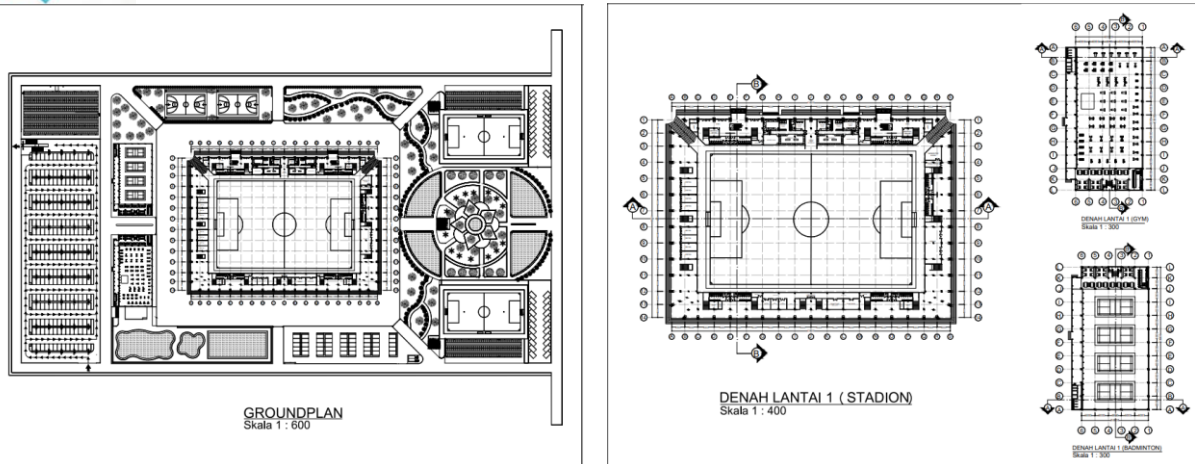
(a) ground plan; (b) first floor plan. (Source: Author,2024)
